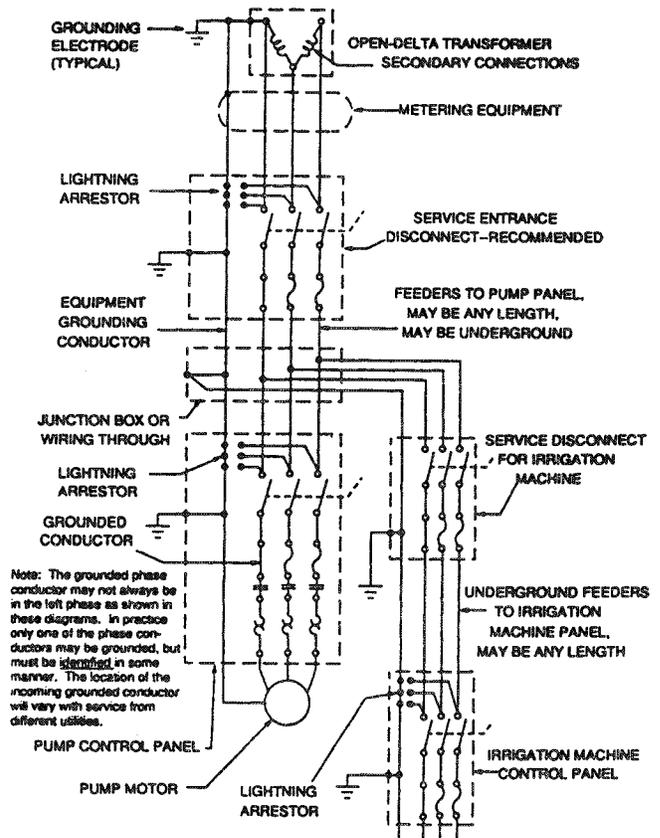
Recommended equipment and grounding for a grounded phase, open-delta transformer secondary connections
